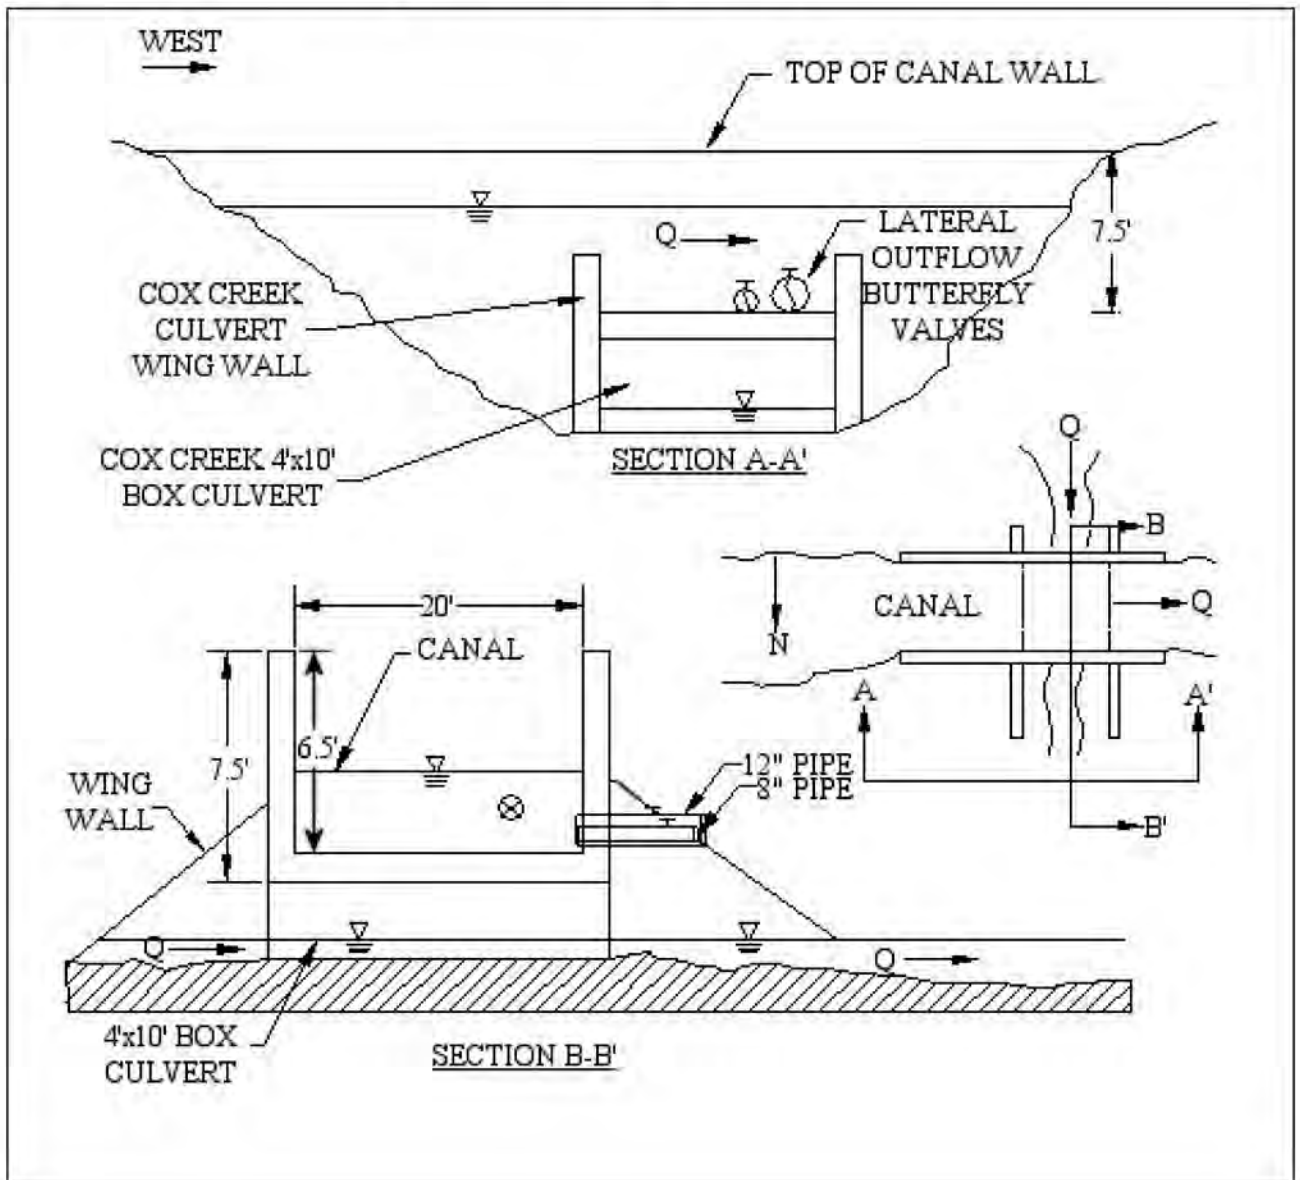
Cox Creek Culvert Passing Under Canal (Note Butterfly Valves)
